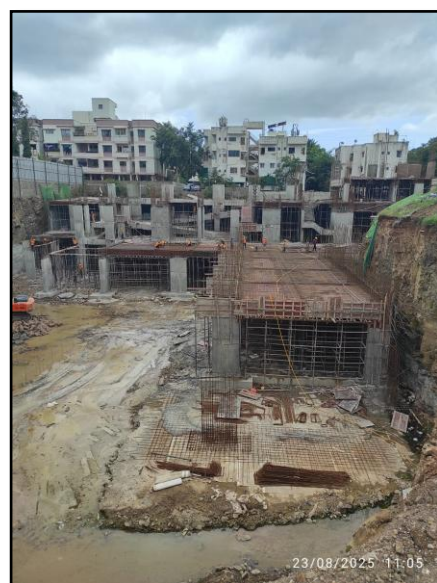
, 6: RCC column and slab casting observed at site, Basement construction and scaffolding system
